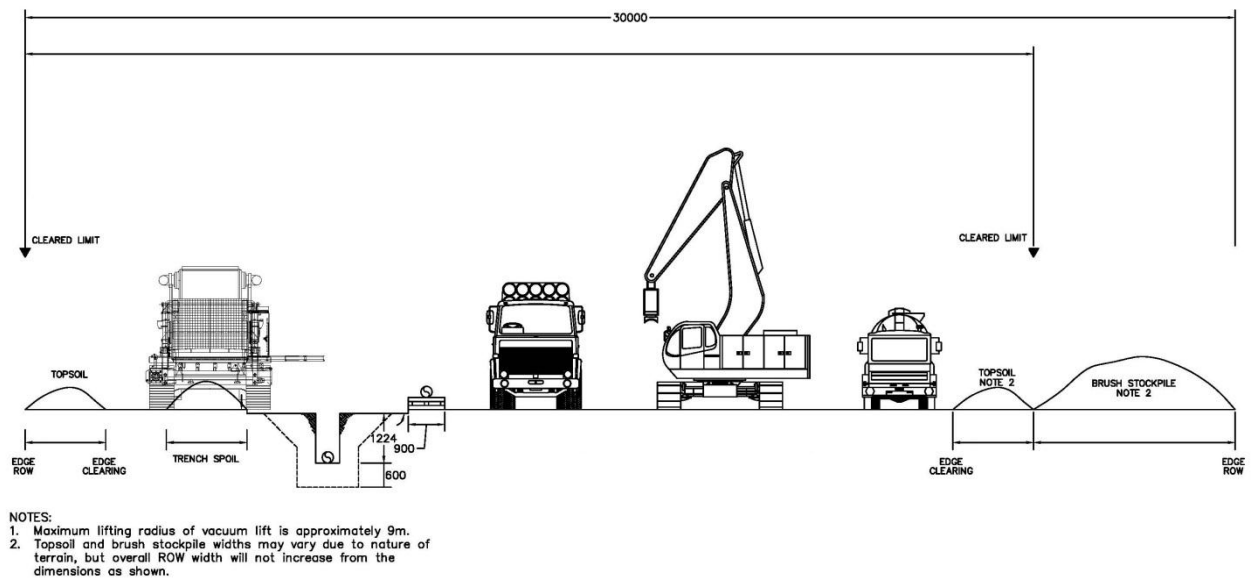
Typical construction ROW layout to be used for the Project construction phase
